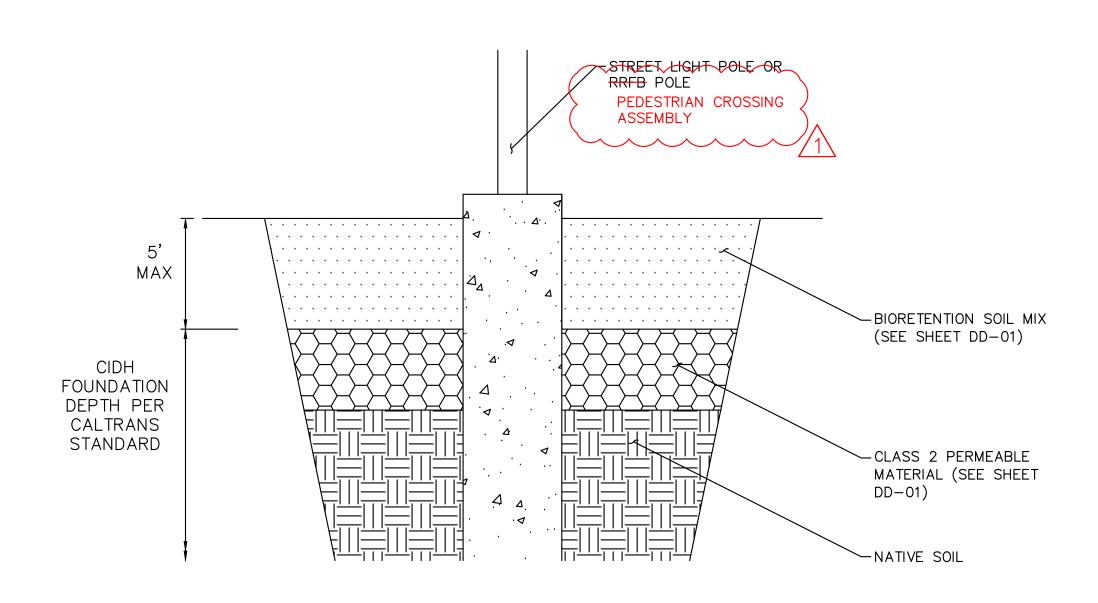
DETAIL B LED STREET LIGHT AND PULL BOX IN BIORETENTION AREA INSTALLATION DETAIL N.T.S.
